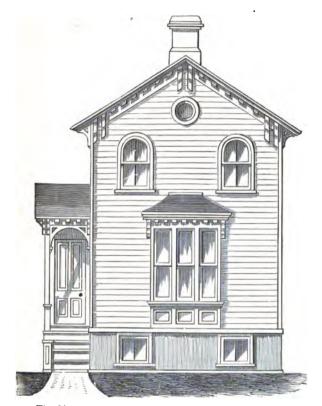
ELEVATION OF HOUSE.—Scale, 8 feet to 1 inch.
